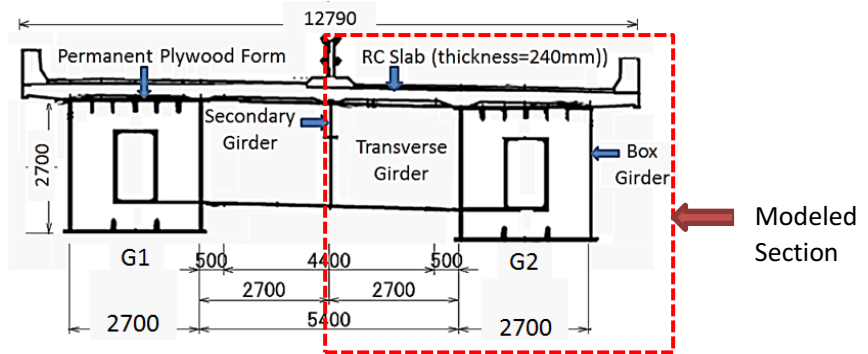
(b) Cross section of Shinkesen Ohashi deck girder bridge showing modeled section
